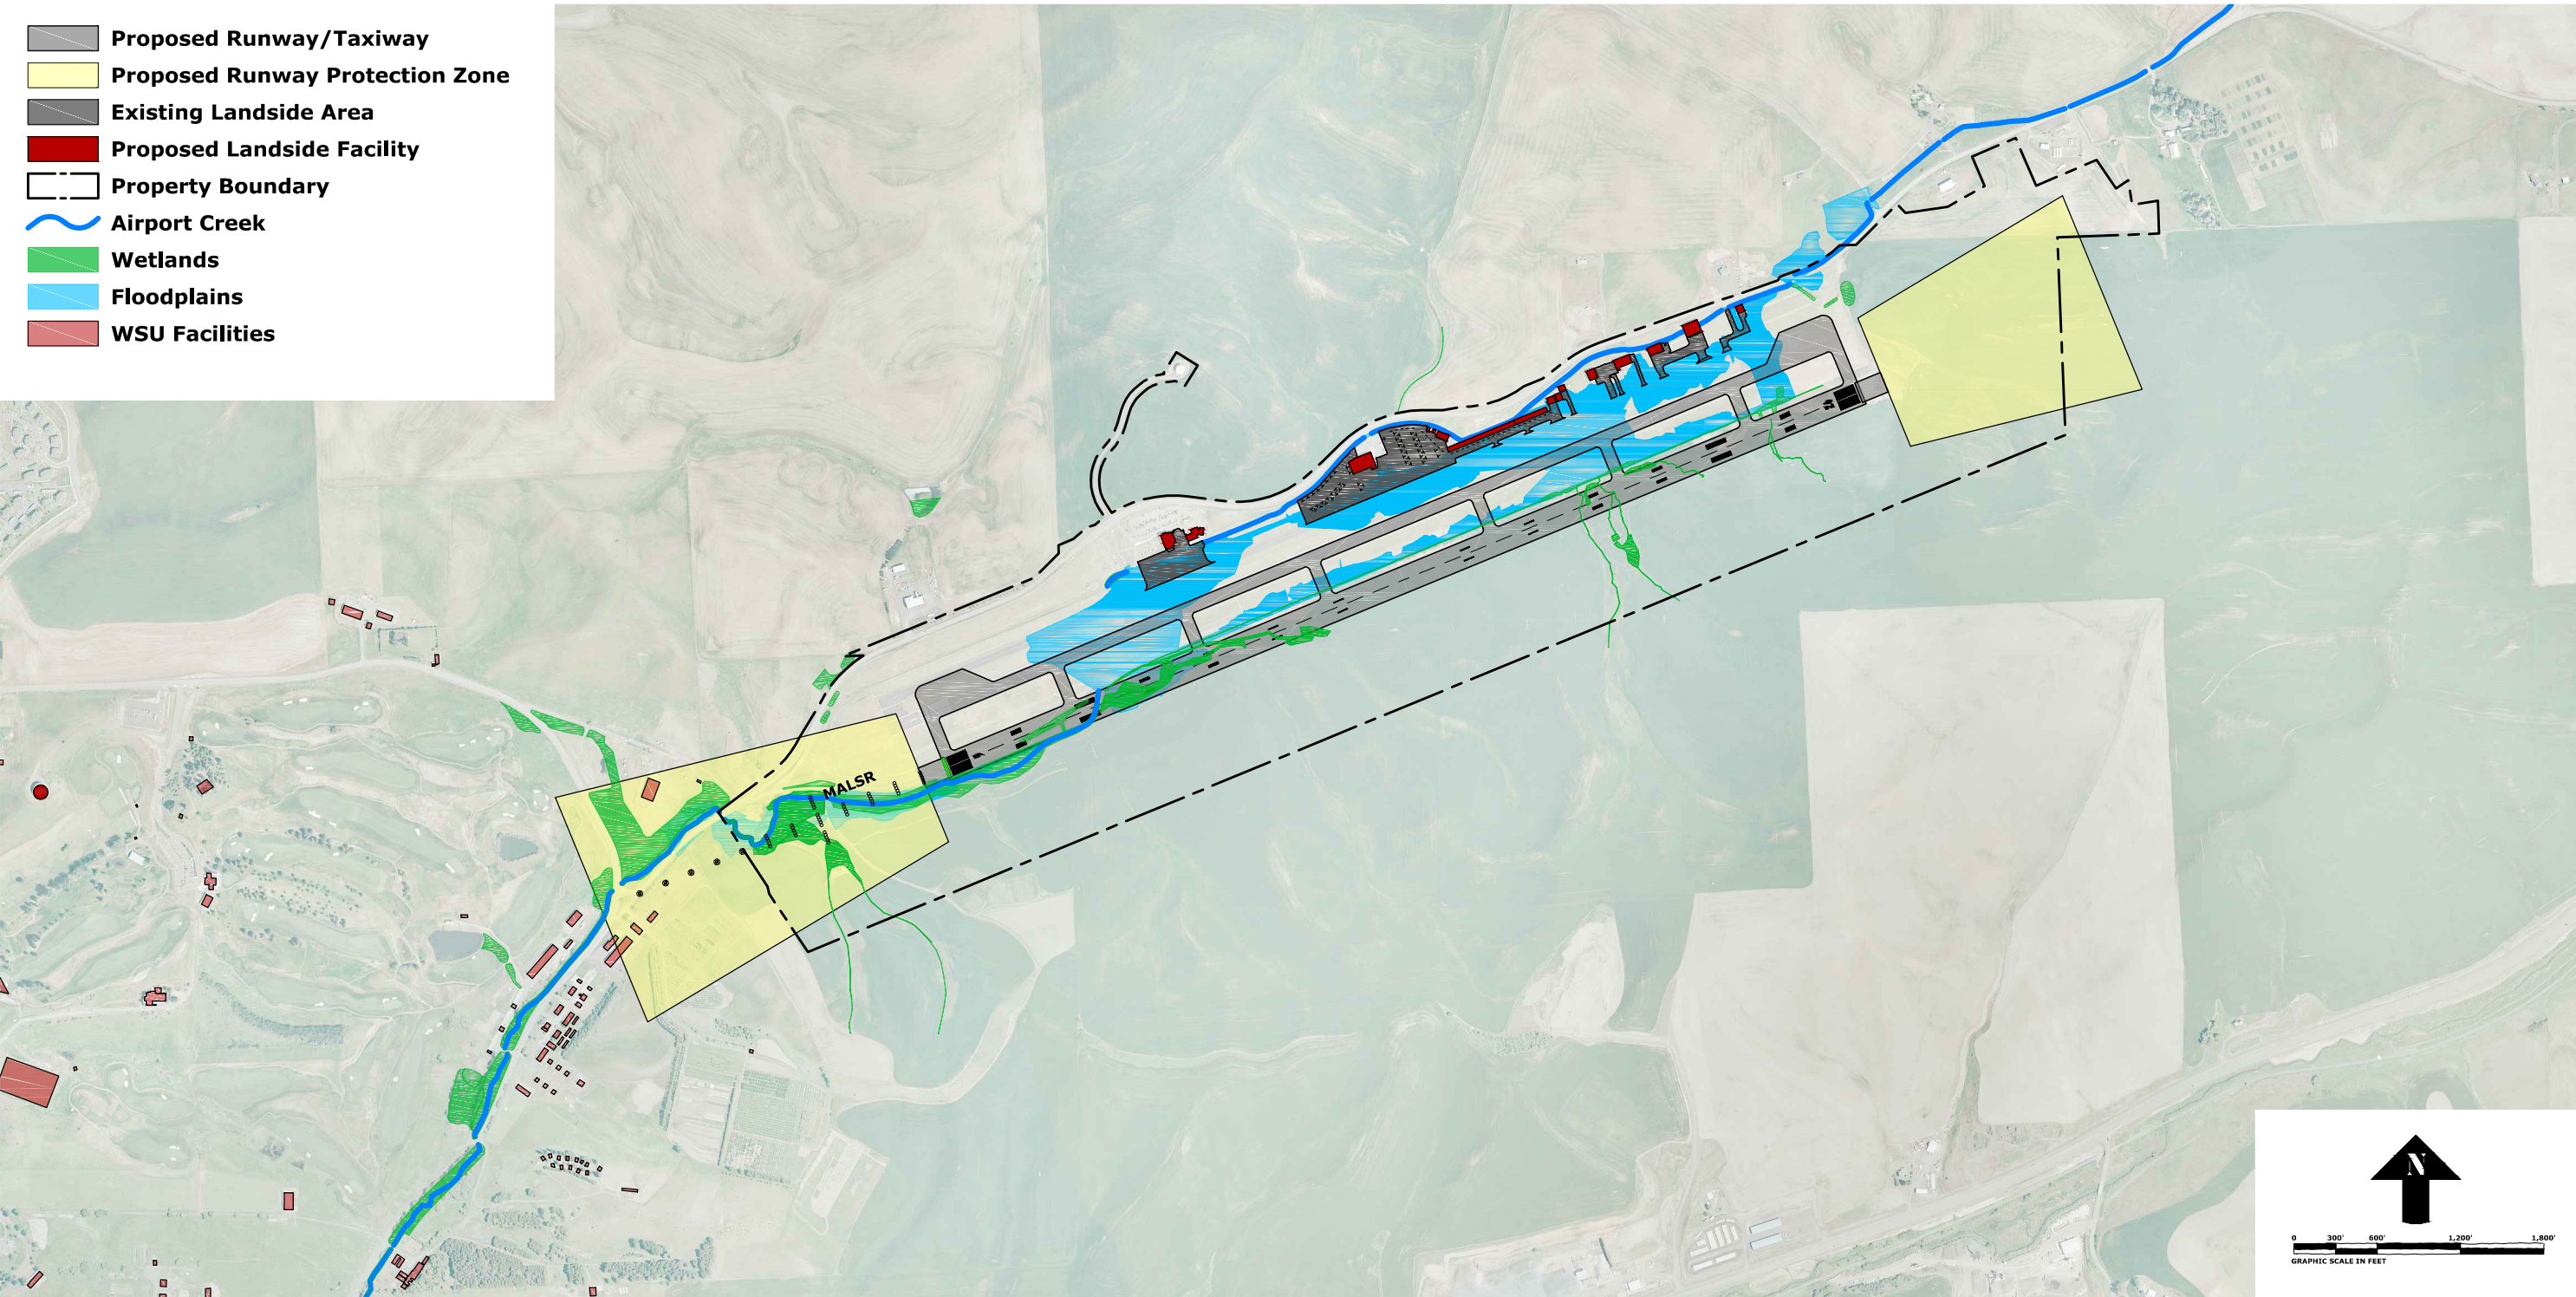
Alternative 1: Shift of Runway South of Existing Runway
